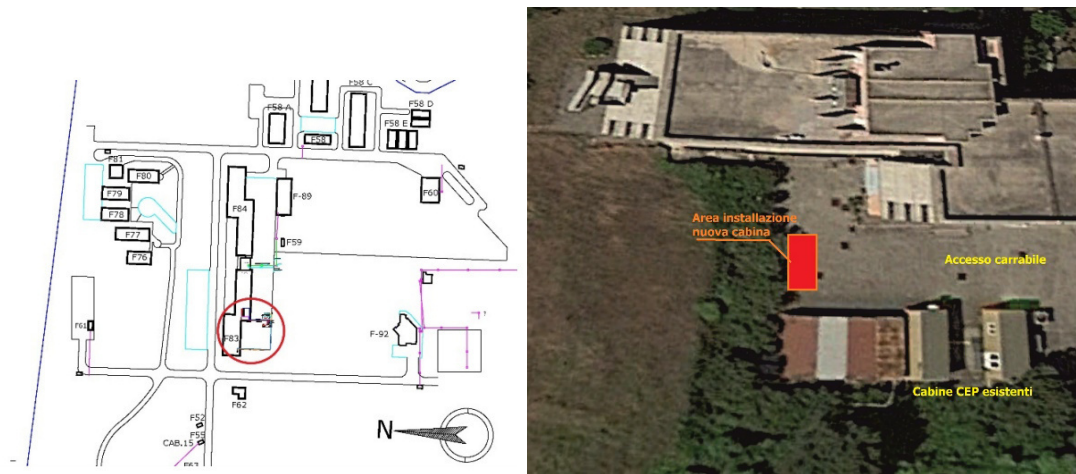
Extract of the floor plan and photo of the installation site of the ENEA research center
